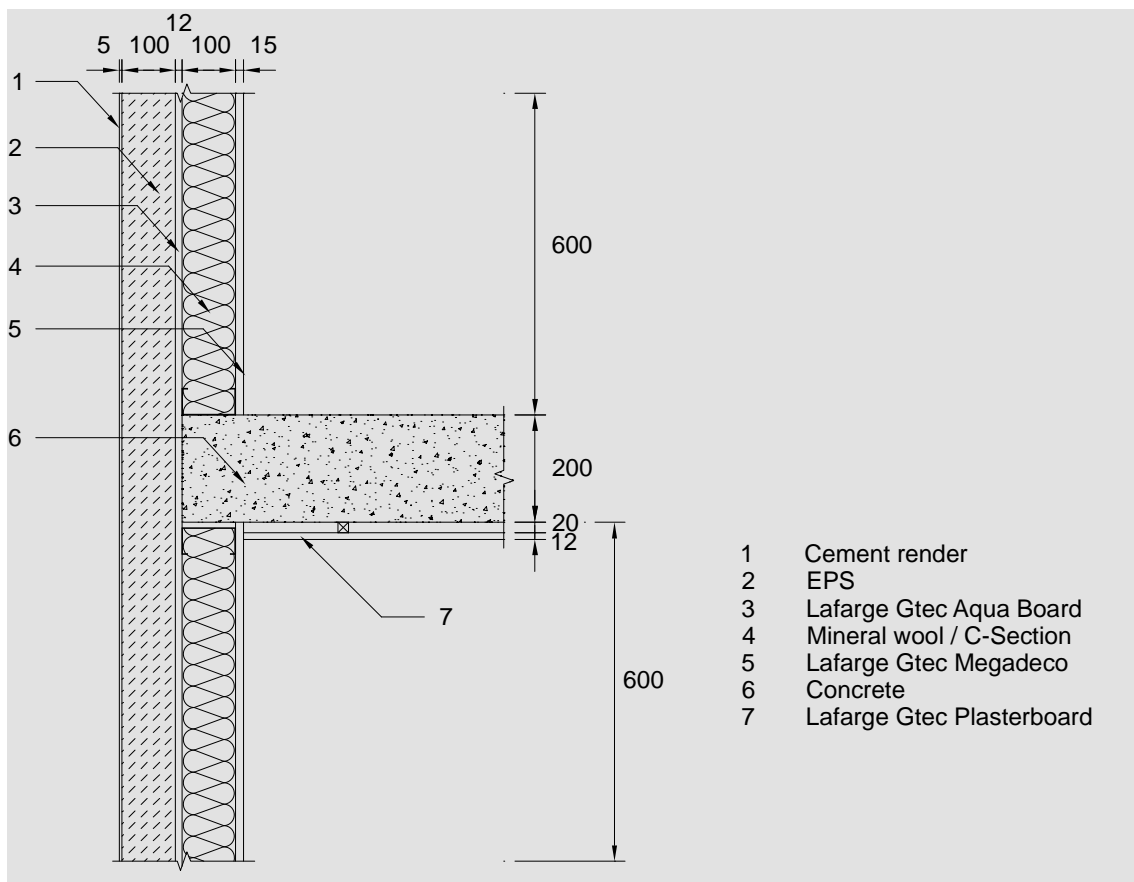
Insulated render (direct fix) applied to an infill wall in a concrete framed building
